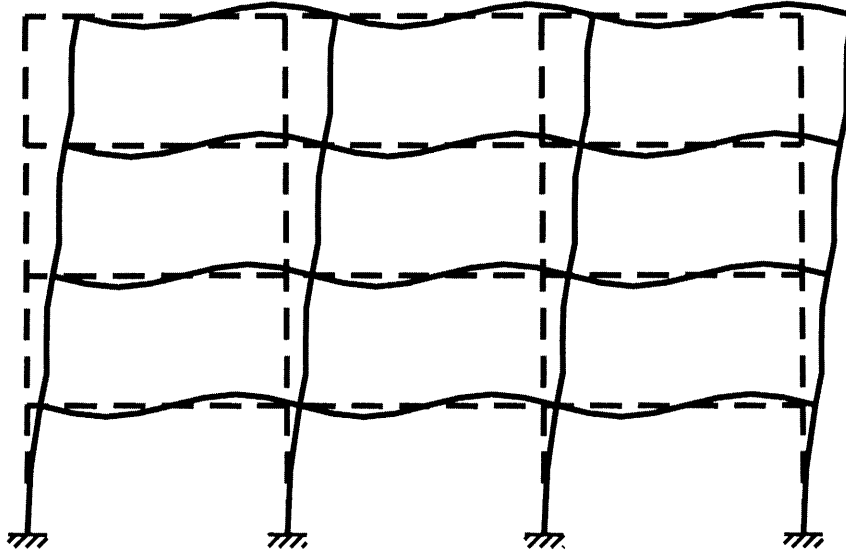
Rigid Frame Lateral Load Resistance Mechanism
